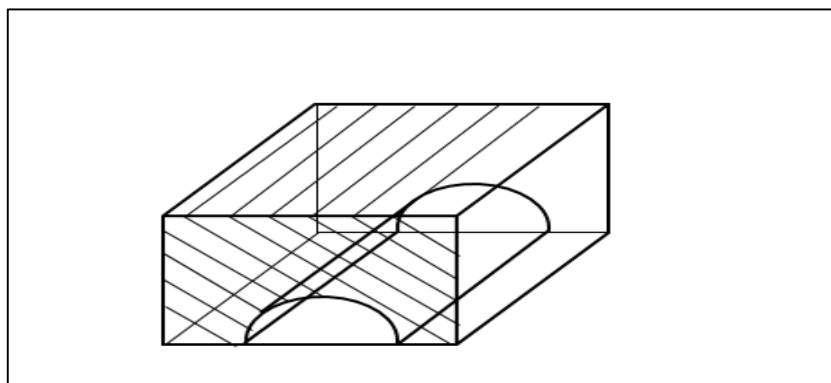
Joint strike parallel to tunnel. Dip 60°; Stress failure at $3.10 \times 10^6 \text{ N/m}^2$
